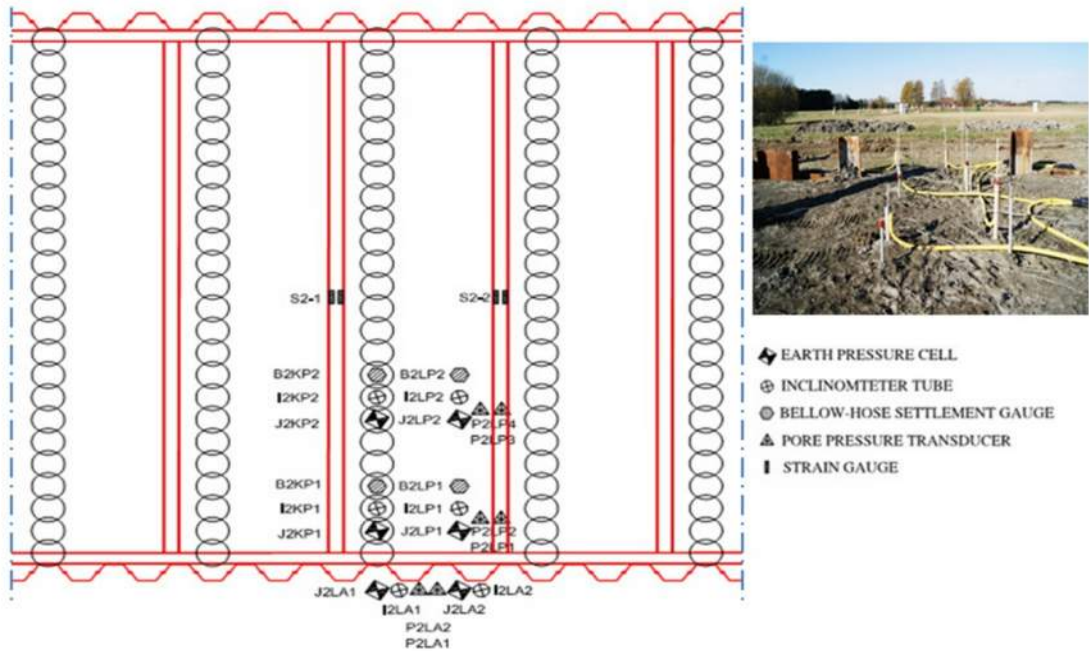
Instrumentation plan and photo of conducted instrumentation for Test 1
